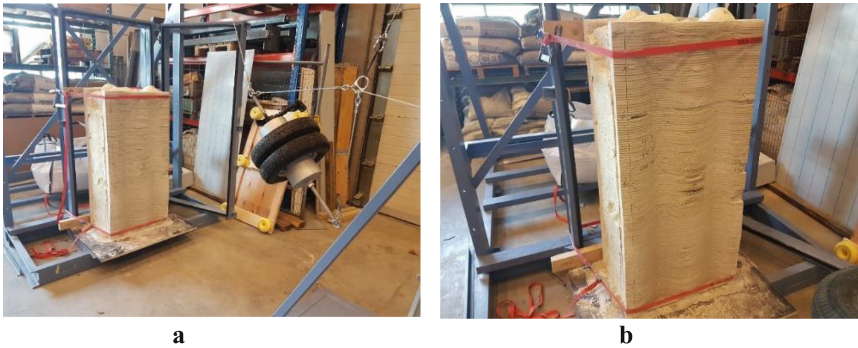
a and b Pendulum impact test set-up, and element after testing with visible damage caused by multiple 1200 mm drop height impacts.
